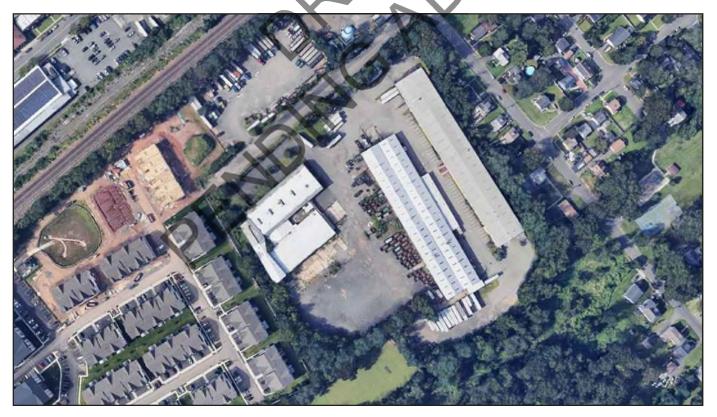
Existing Site Plan Courtesy of KHovnanian Homes
